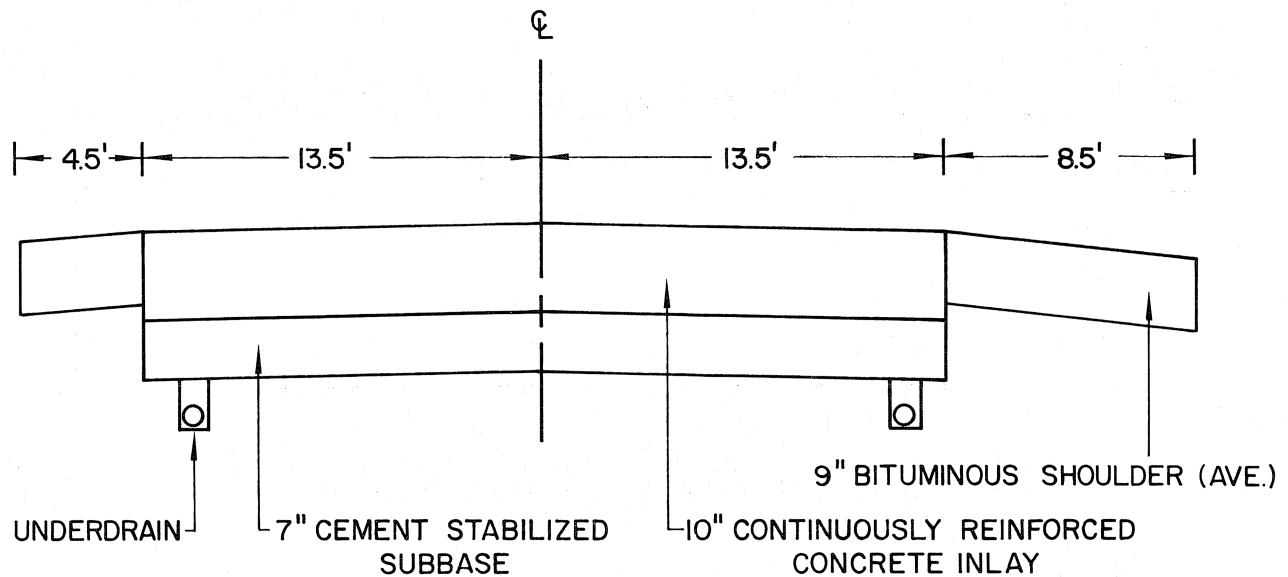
CROSS-SECTION OF RECYCLED CONCRETE INLAY
